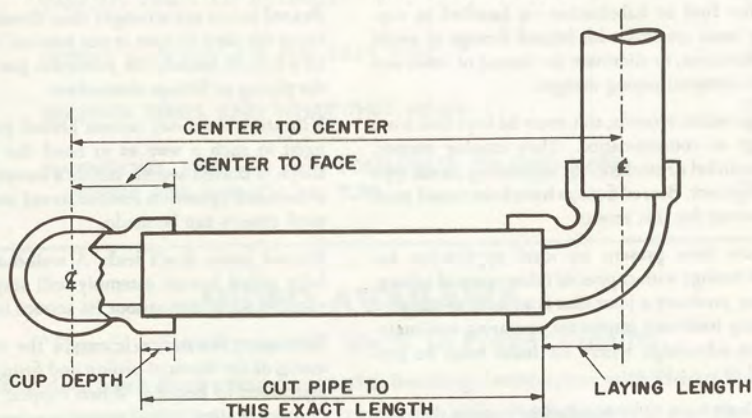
You can work to accurate measurements by brazing because the cut ends of every piece of pipe are seated against precision-machined shoulders in the fitting.
